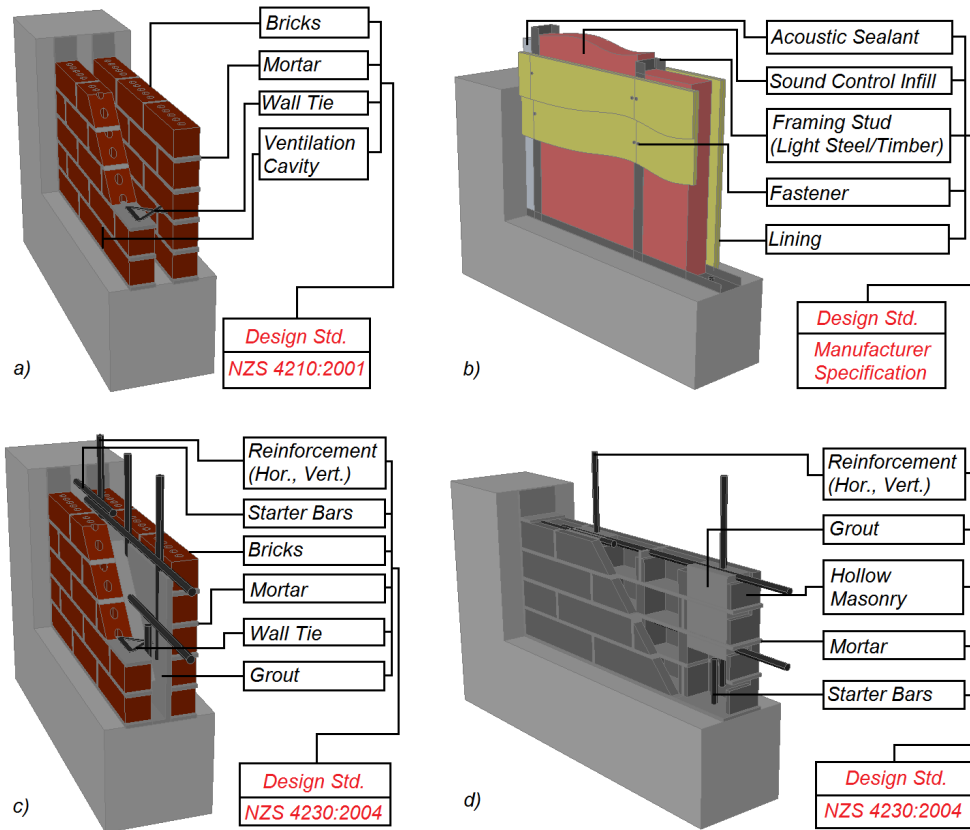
a) Unreinforced Masonry Infill, b) Light Steel/Timber Framed Wall, c) Reinforced Grouted Brick Masonry, d) Reinforced Hollow Masonry
